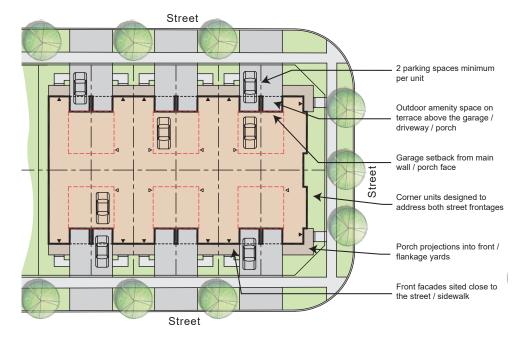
Conceptual plan layout for back-to-back townhouses
